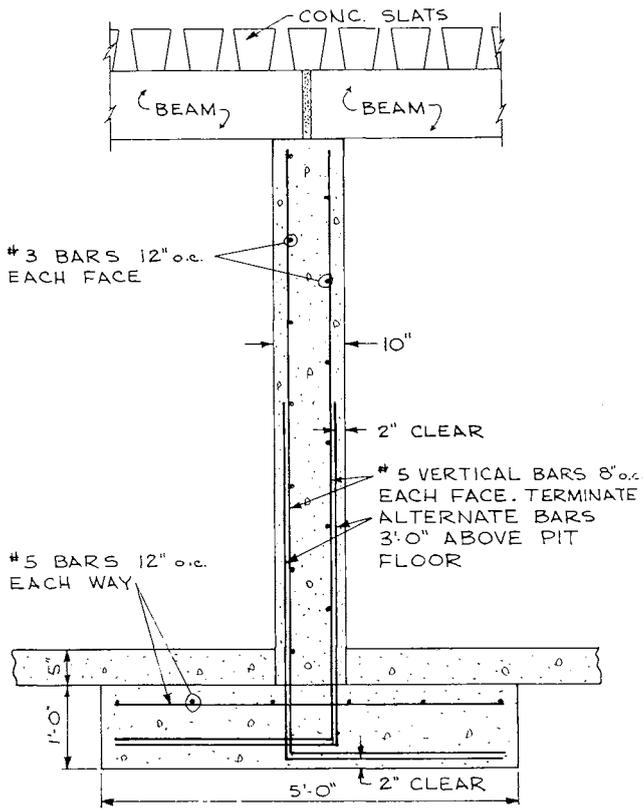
Footing size and steel needed in both footing and wall when wall is designed as a cantilever wall not fixed at the top.
